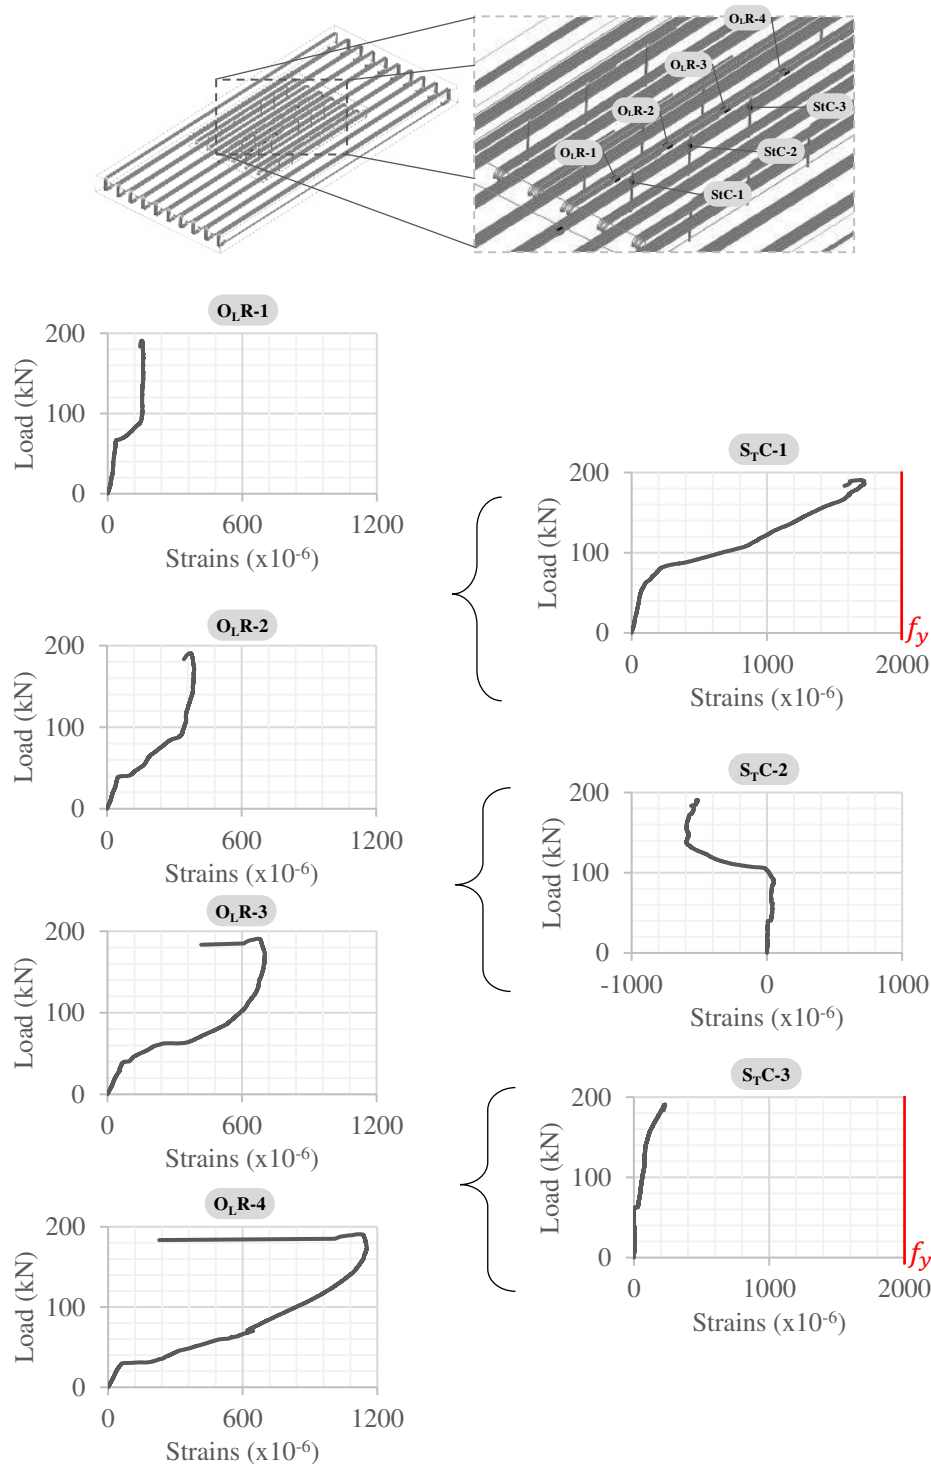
Instrumented steel dowels and longitudinal reinforcement on RS-STC-4 specimen, and respective strains measured.
